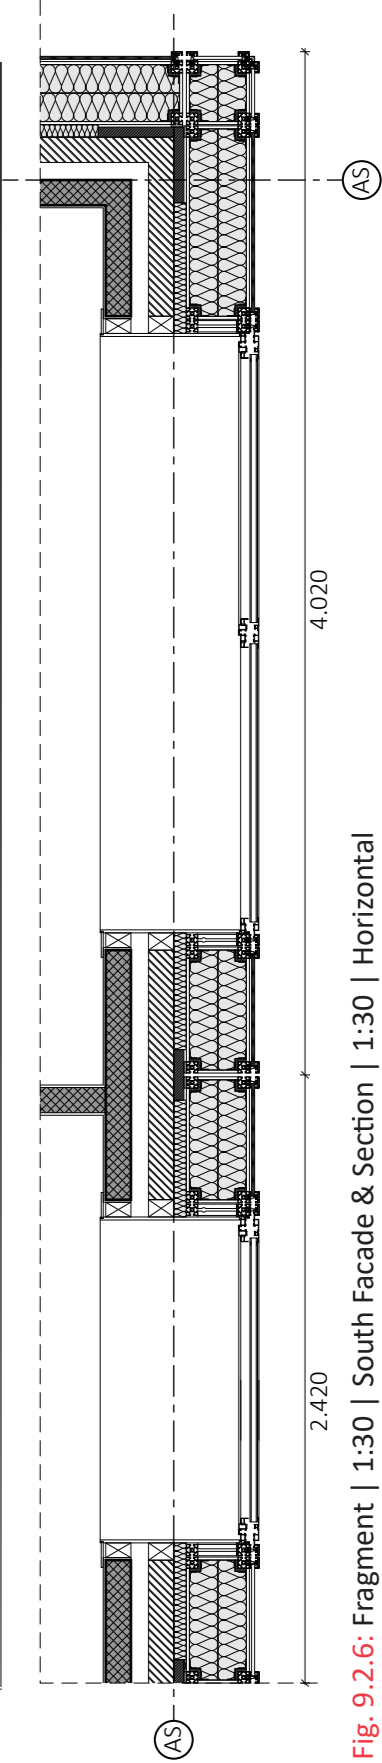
Fragment | 1:30 | South Facade & Section | 1:30 | Horizontal
